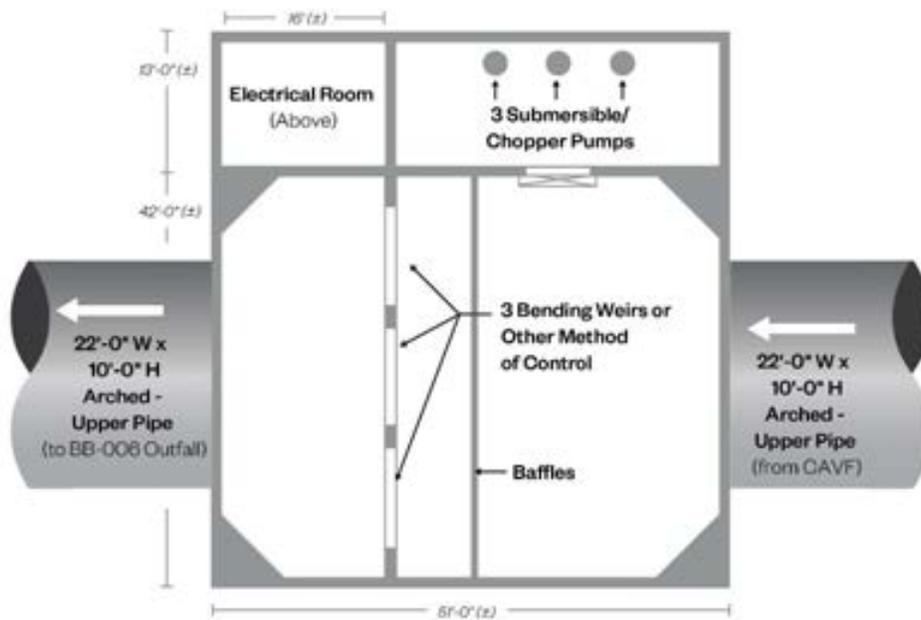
Layout of Alternative 9-3 – Outfall Storage Pumping Station for BB-006
